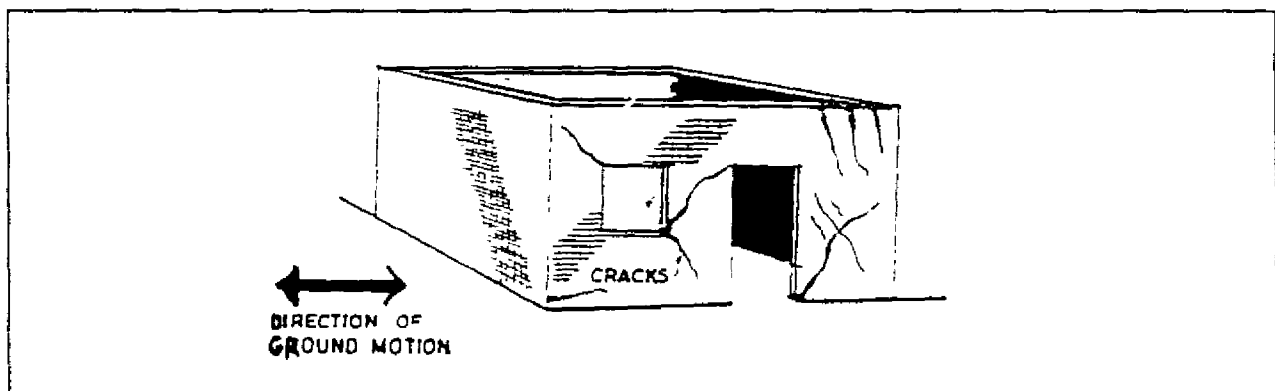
Cracking in Shear Wall at Corners of Opening
